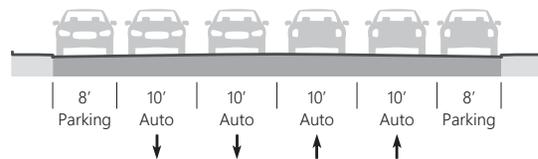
GAGE AVENUE - EXISTING CROSS SECTION
